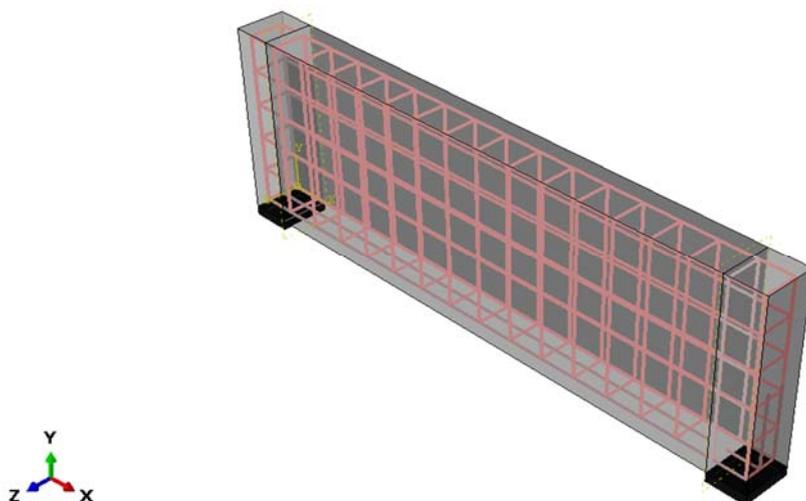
deep concrete beam (HSC) type DB\_HSC\_GB
